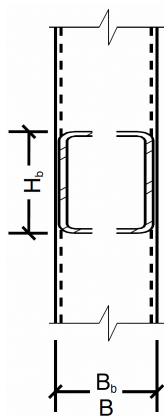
Branch Wall Effective Width for Plastic Section Modulus
